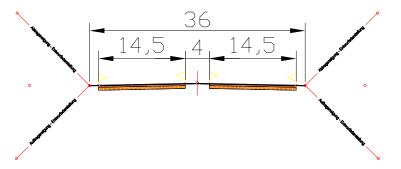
Cross section RQ36 with its dimensions [m] according to (FGSV, 2008)
